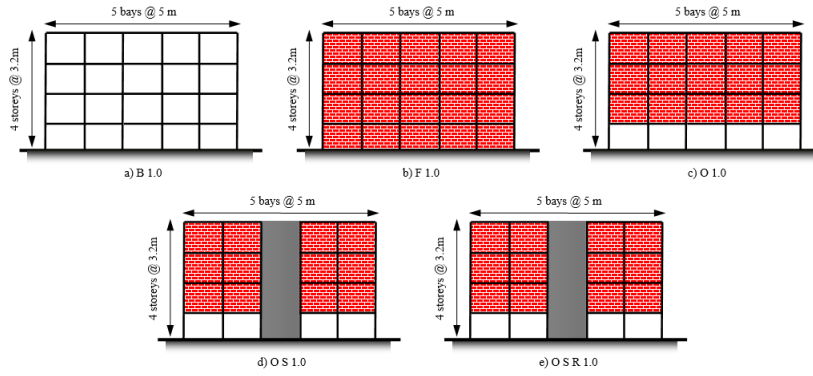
4 Storey RC Frames with One Multiplication Factor (Fundamental Models).
